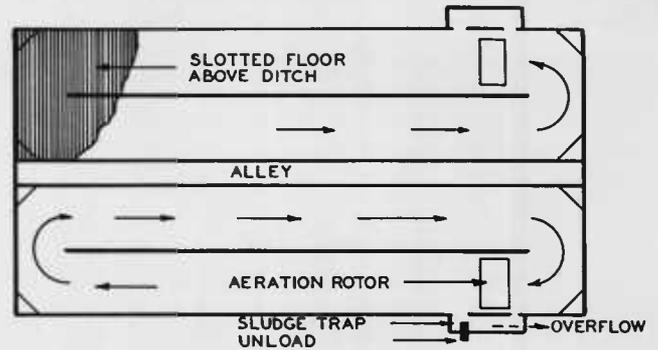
Schematic diagram of a typical oxidation ditch for a swine installation below a slotted floor.
